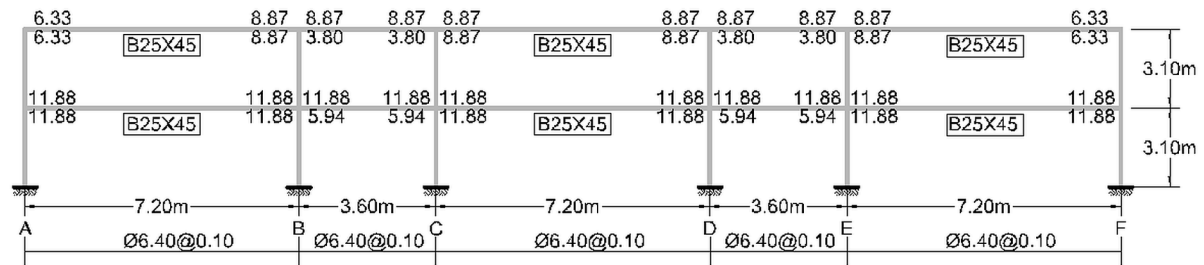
Educational facility, geometry and reinforcement in beams of the Frame 2
